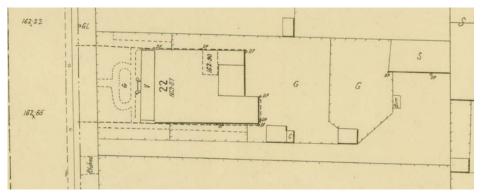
MMBW Detail Plan no. 995, dated 1901, showing allotment no. '22' on the north side of Armadale Road (source: SLV).
